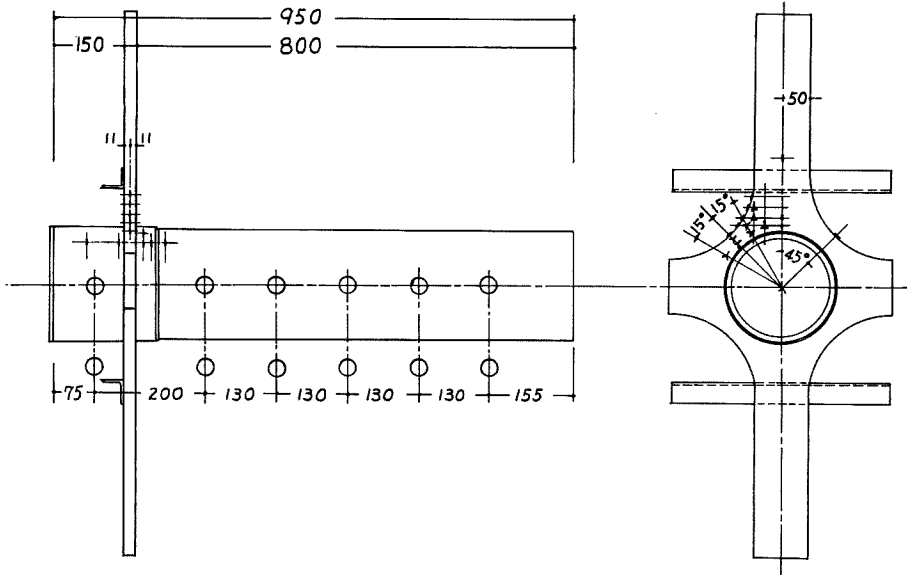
Typical wire strain gage location for “tension type” specimens—PJ-3.
